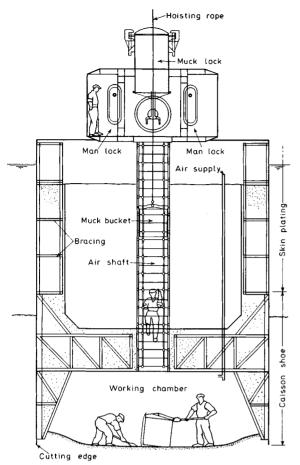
Compressed-air caisson. (After Wilson and Sully (1949) Compressed air caisson foundations. Works Construction Paper Number 13, Institution Civil Engineers)
